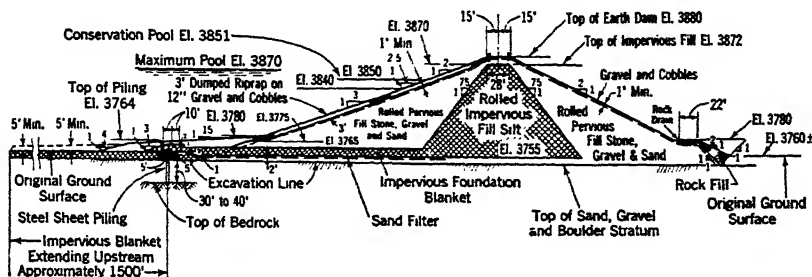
North embankment, John Martin Dam, Caddo, Colo.
